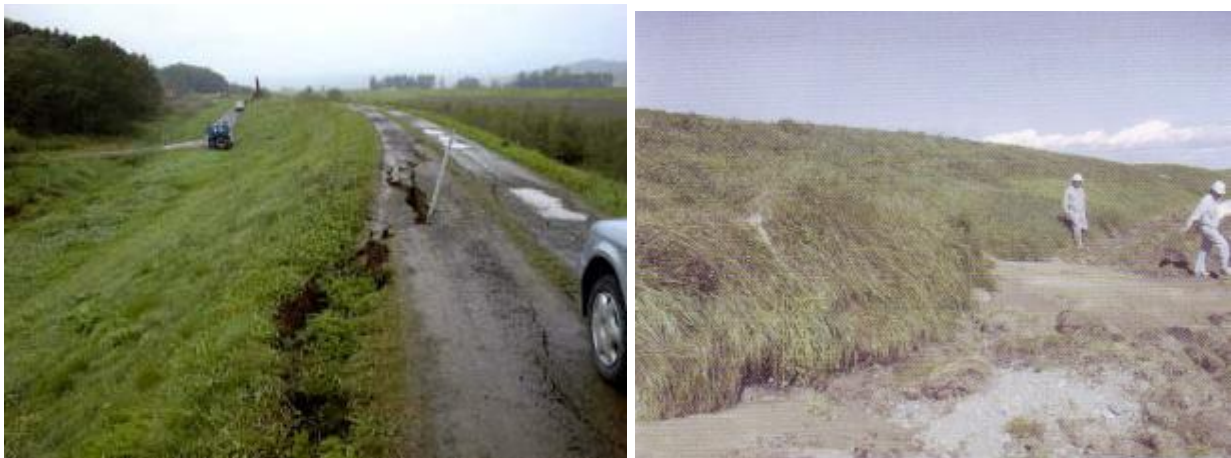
Cracking on the access road on the levee crest at Section 9 with slip and settlement on the land-side slope.
